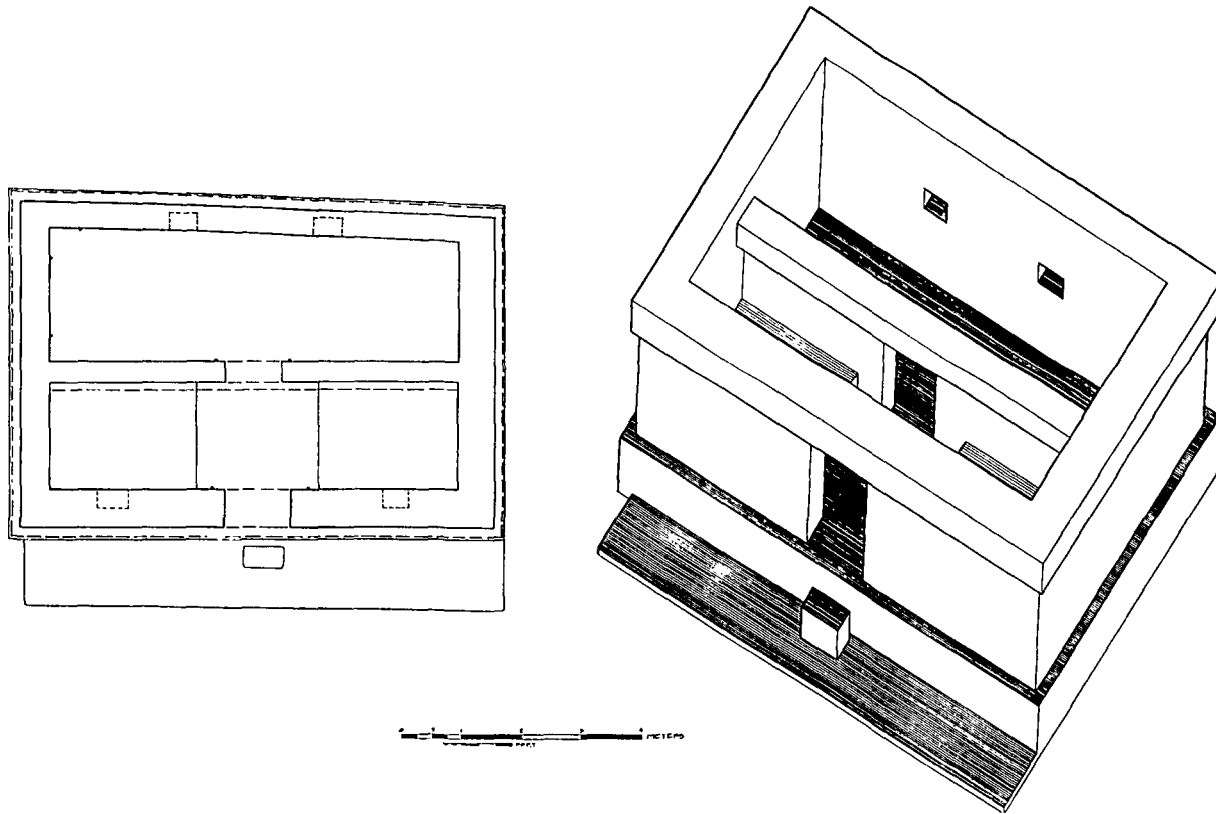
Isometric drawing and plan of Structure 3 at the Ceren site. The structure was built on top of a substantial earthen platform; walls were of solid tamped earth. The structure featured two large benches in the outer room, and niches in the front and the back wall. Adobe lintels were supported by wooden lintels. Drawing by Karen Kievit.
